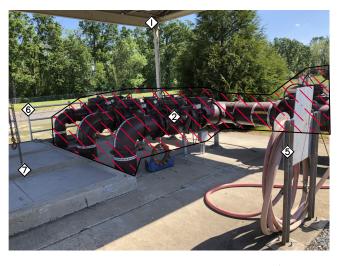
PHOTO: PUMP DISCHARGE PIPING 1 300-D-2
